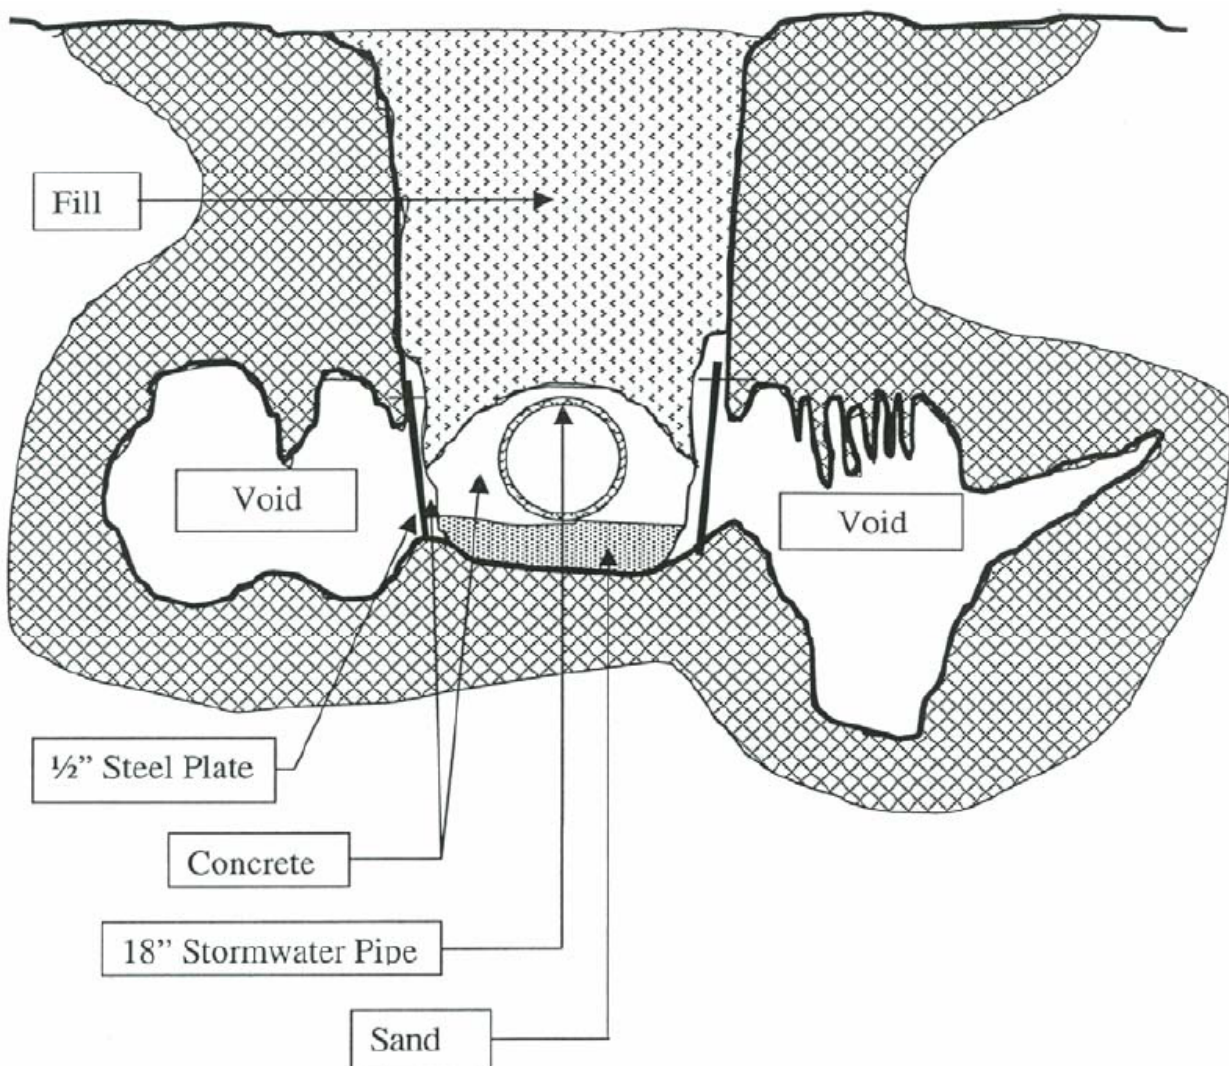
Typical Cross Section Through Trench with Pipe (no scale)
